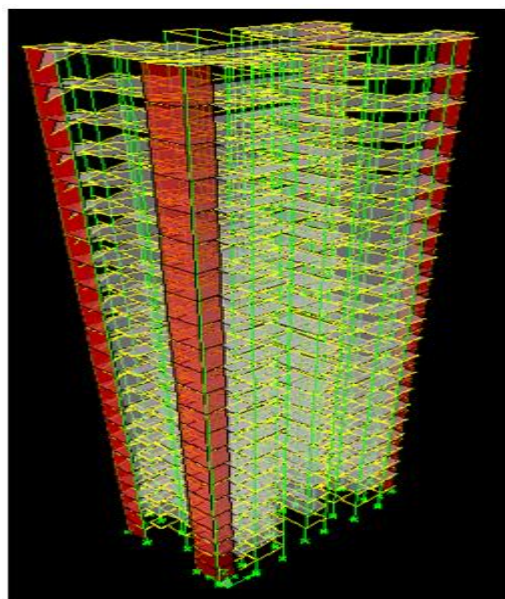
Deformation of G+21 Storey RCC Building with Edge Shear Wall
